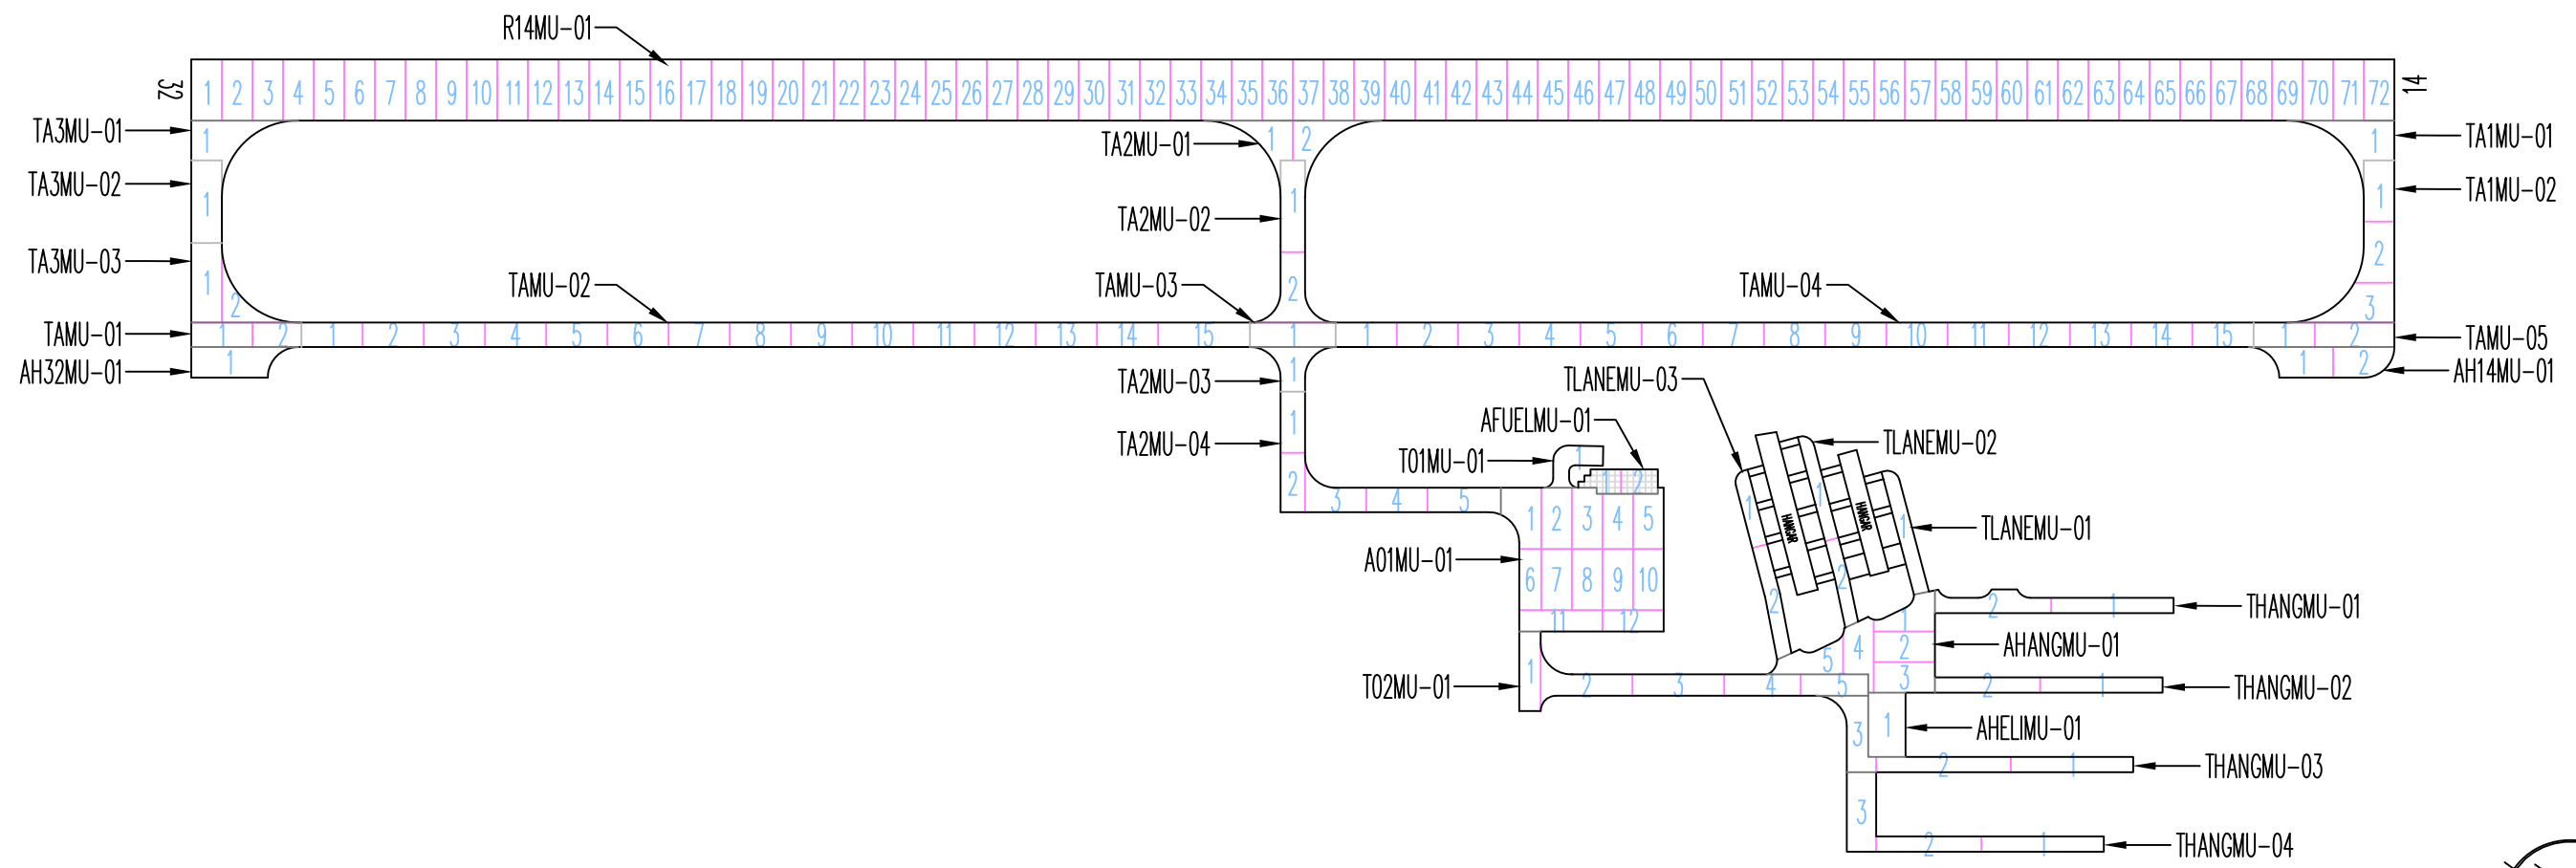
Pavement Branch, Section and Sample Unit Layout.
